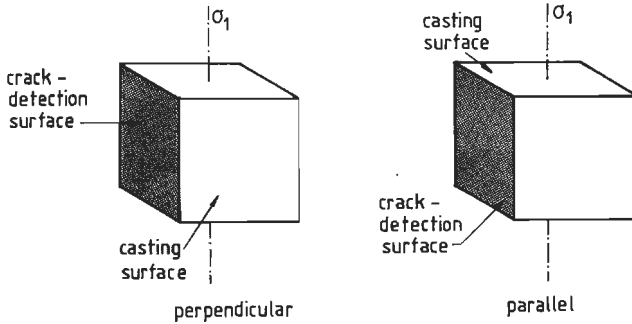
Crack-detection for specimens 2B2-1 through 2B2-6.
